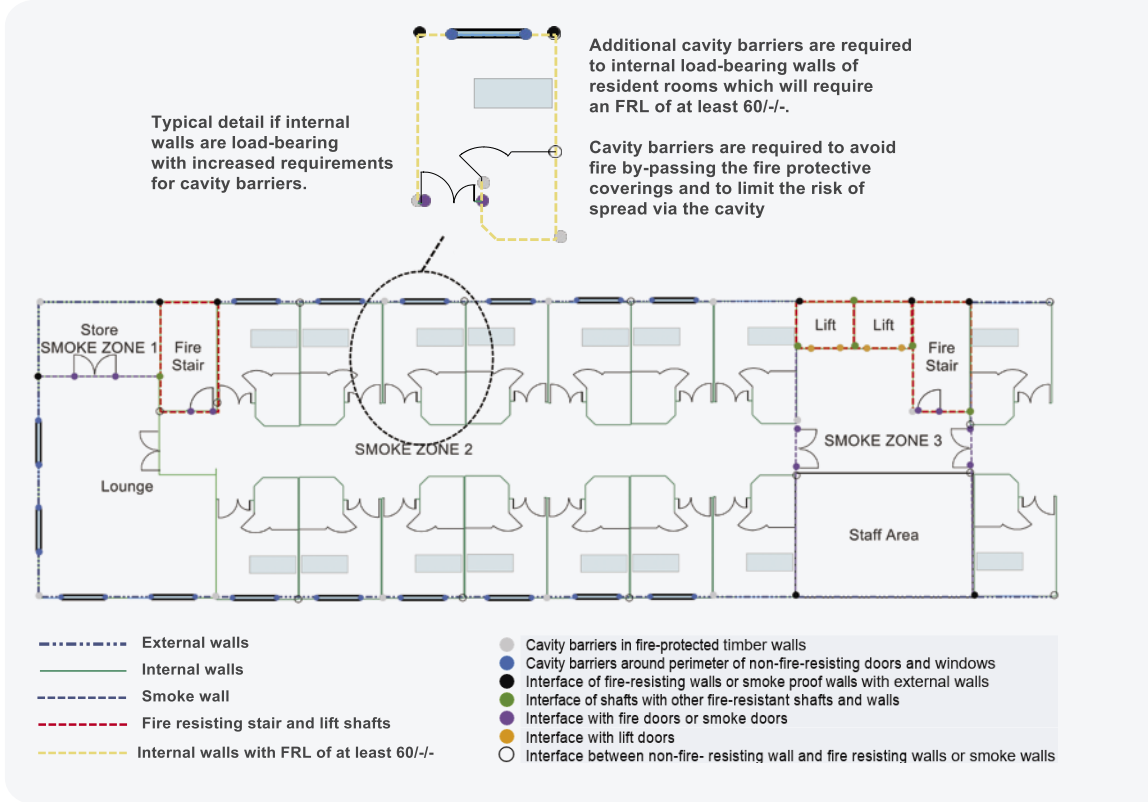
Floor plan of residential area of a Class 9c building showing typical cavity barrier locations.
